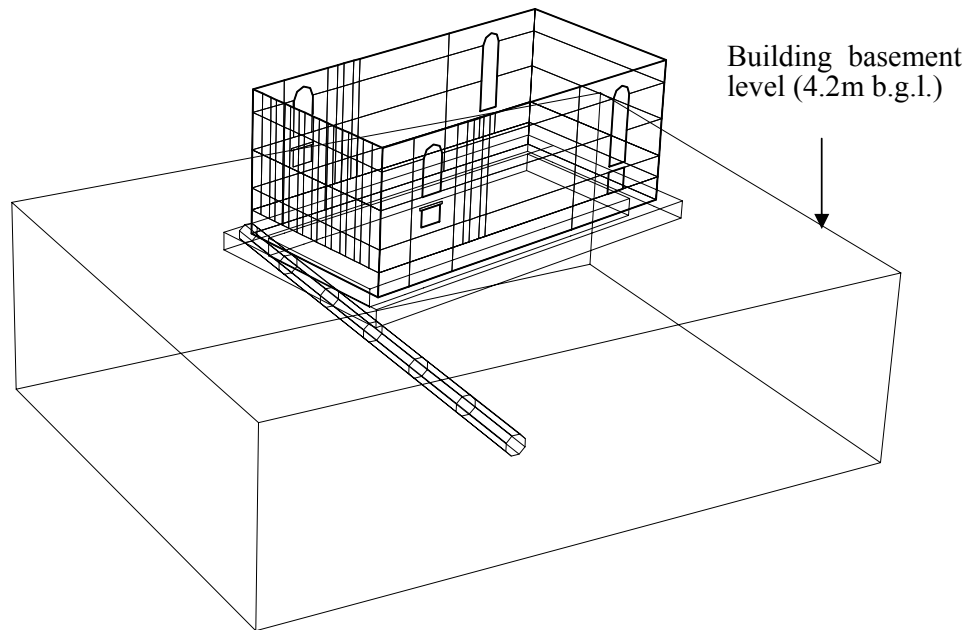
Wireframe geometry of final Mansion House model with 3m thick foundation and six tunnel excavation stages
